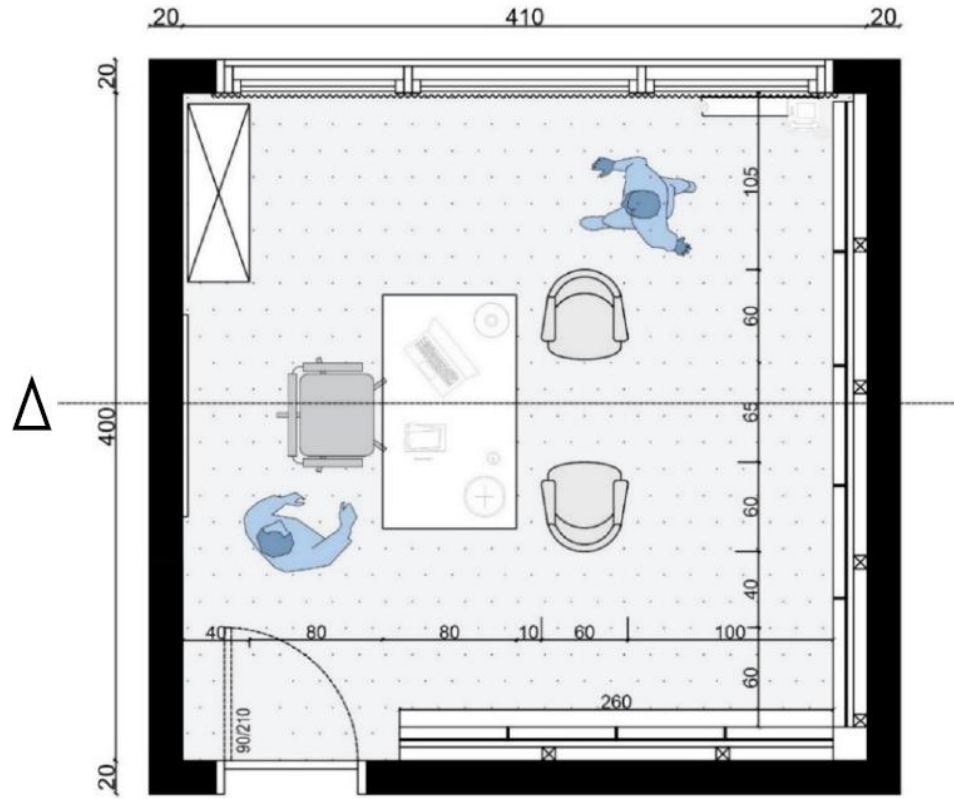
Bilkent VR laboratory plan (not to scale) (Kuş,2019)
